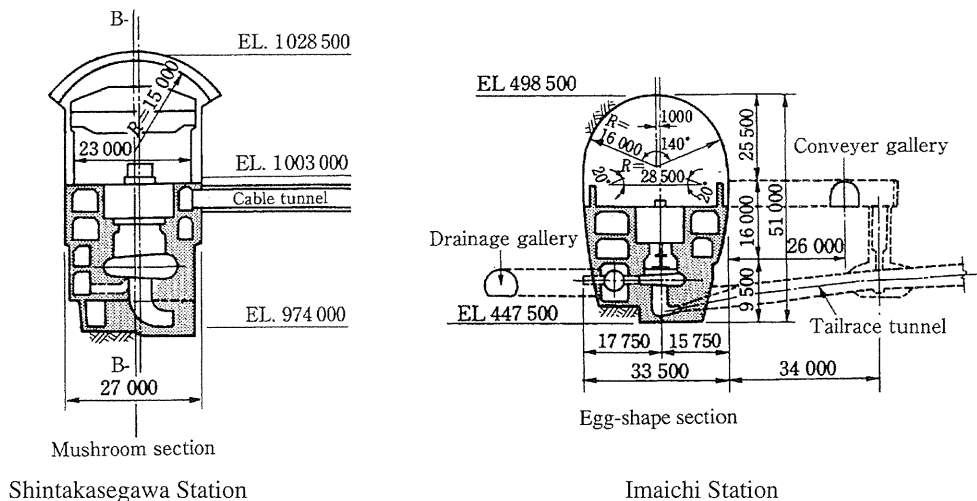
Typical cross section of underground hydropower station<sup>12)</sup>.
